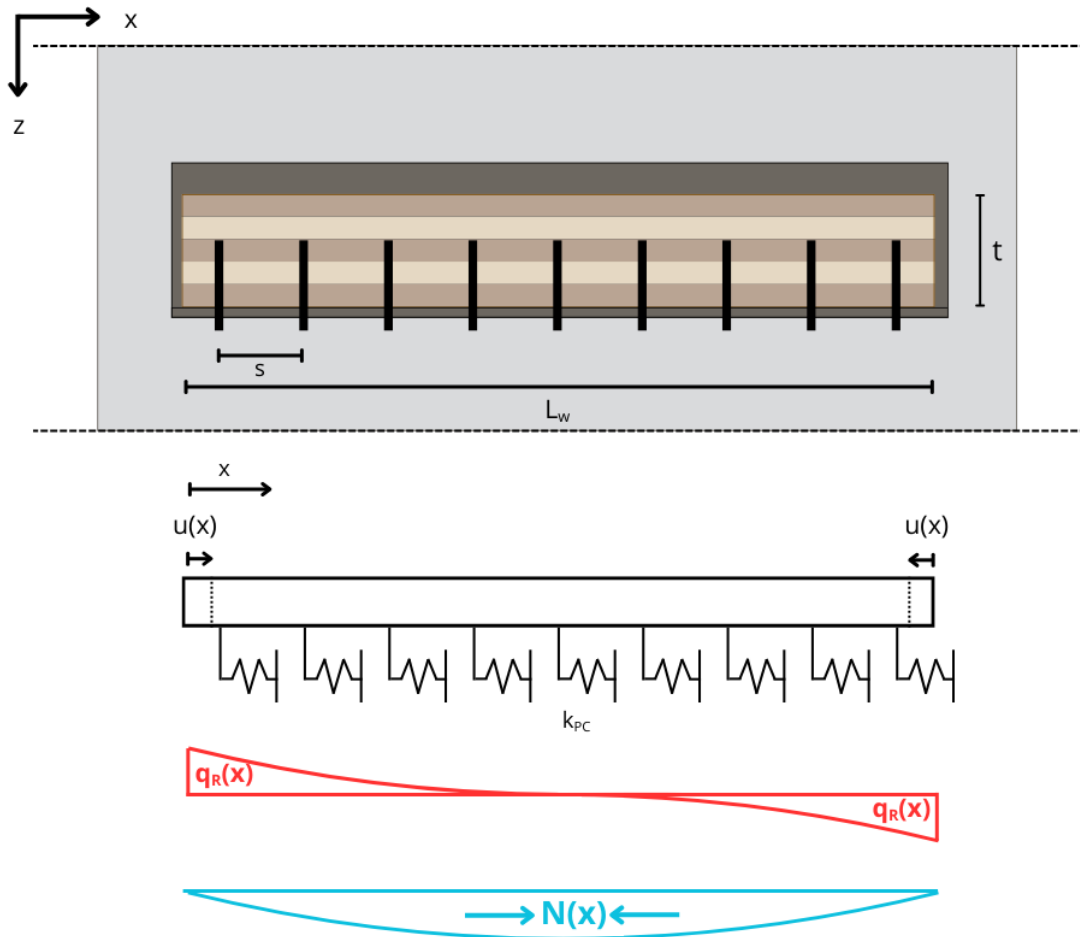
1D beam-on-elastic-foundation model of a floor panel with continuous core restraint.
